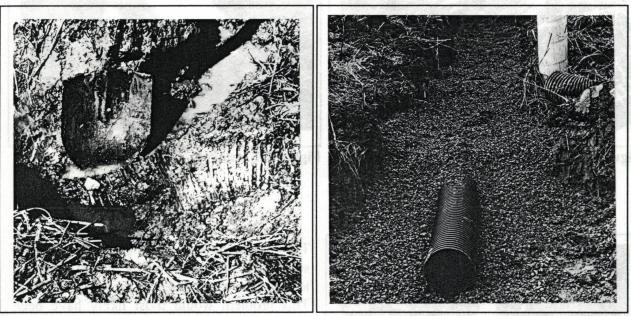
Damaged drain pipe. Figure 27 Chips surrounding new outlet.
